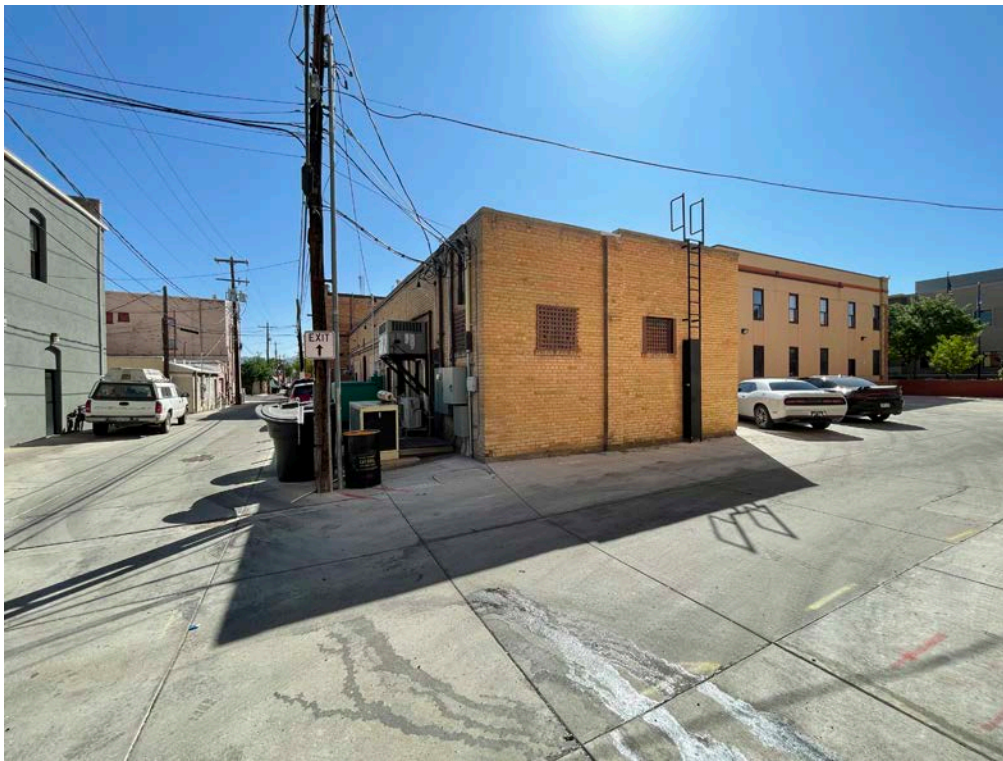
Annex west elevation, west end of building at alley. Montrose City IT Area.
